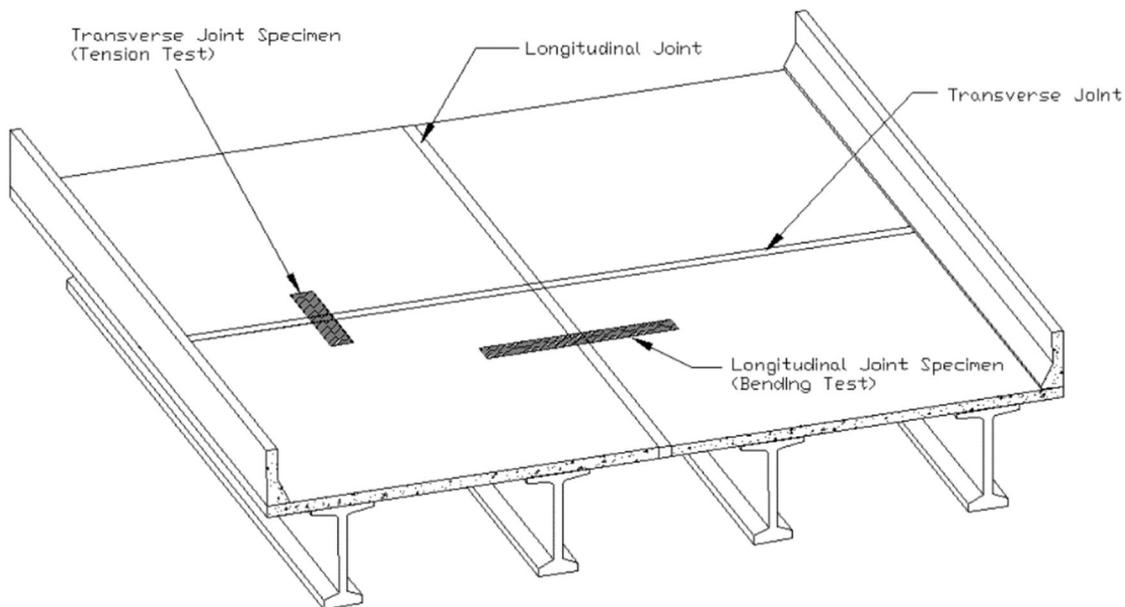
Transverse and longitudinal field connections/joints for precast deck slabs
